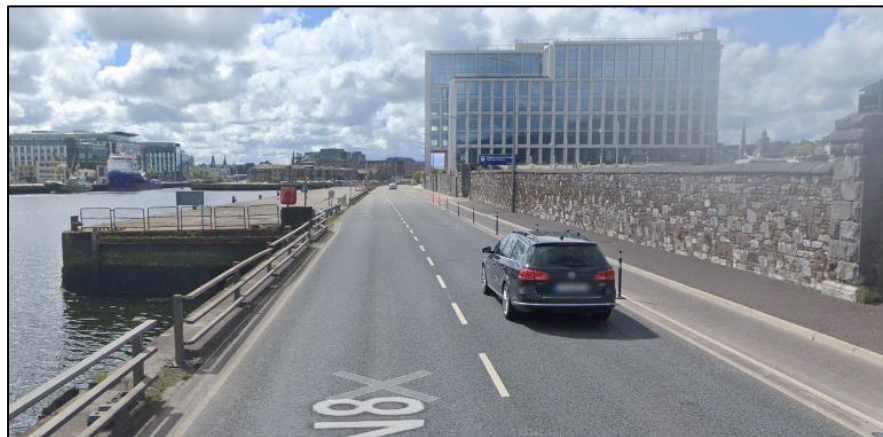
Typical Cross Section of existing N8 at Horgan's Road (inbound cycle lane)
